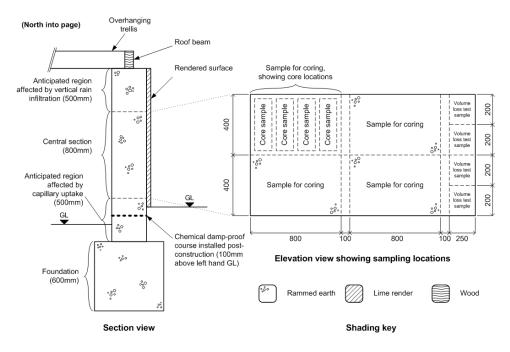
Sketch of key details of investigated wall (dimensions in mm, not to scale)
